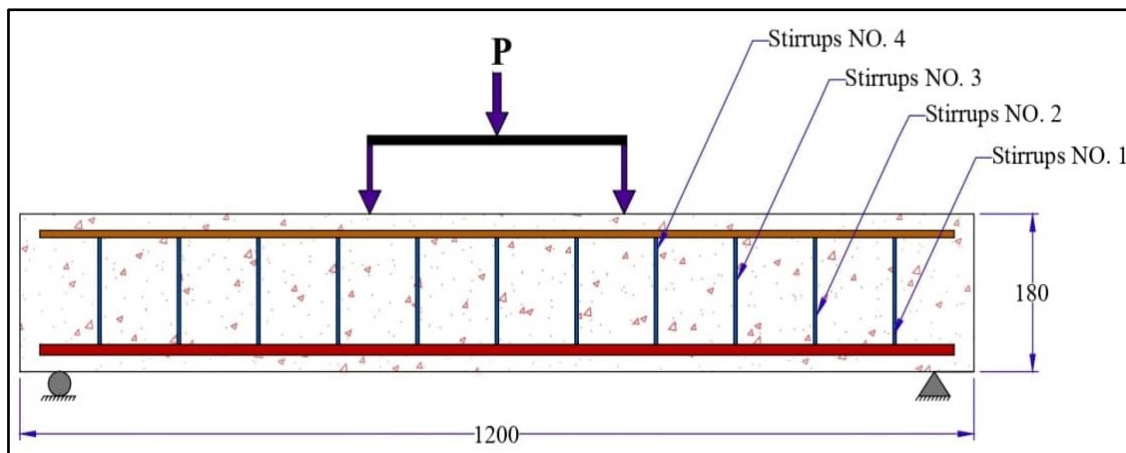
Steel Stirrups Used in CB to Locate Stresses.
